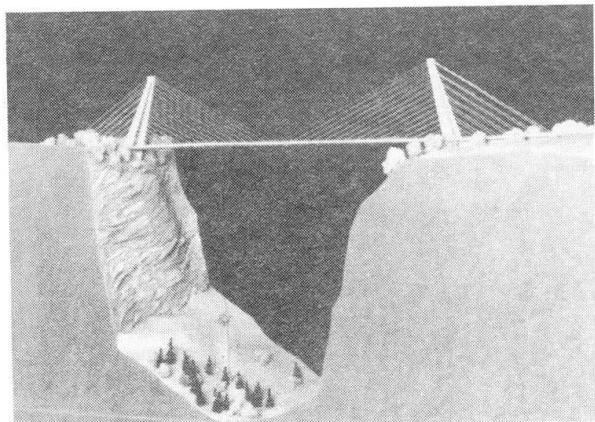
Project of the La Dala Bridge with a slender concrete deck (span 210 m)
